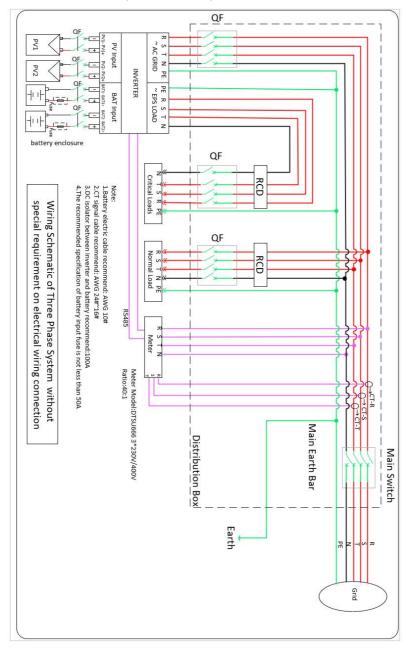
Electrical connections (Plan B:Meter +CT)
